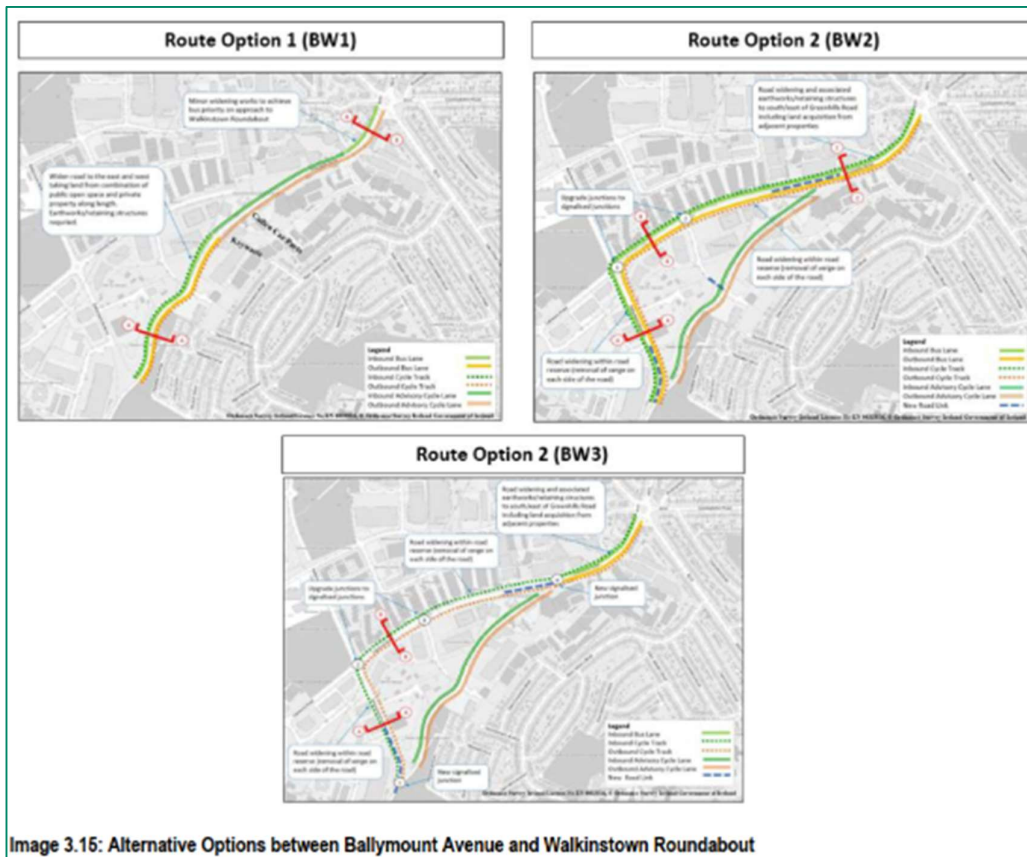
Alternative Options between Ballymount Avenue and Walkinstown Roundabout
